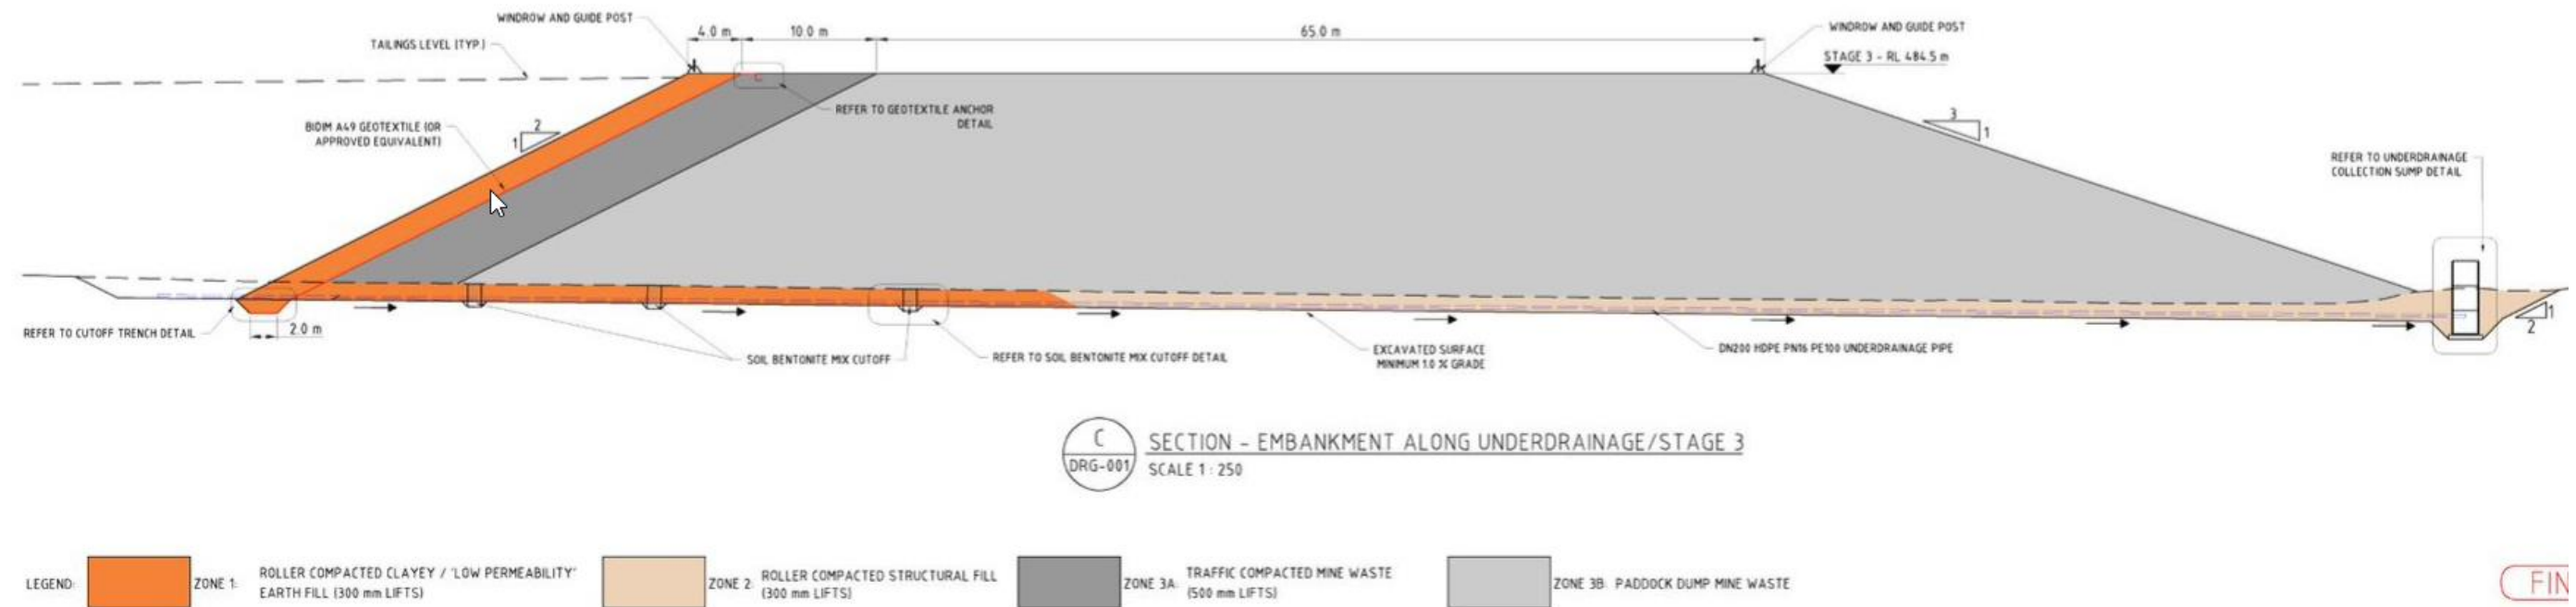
Embankment wall construction for stage 3 IWLTSF, showing underdrainage. At other points it is the same construction except that base is in situ materials
